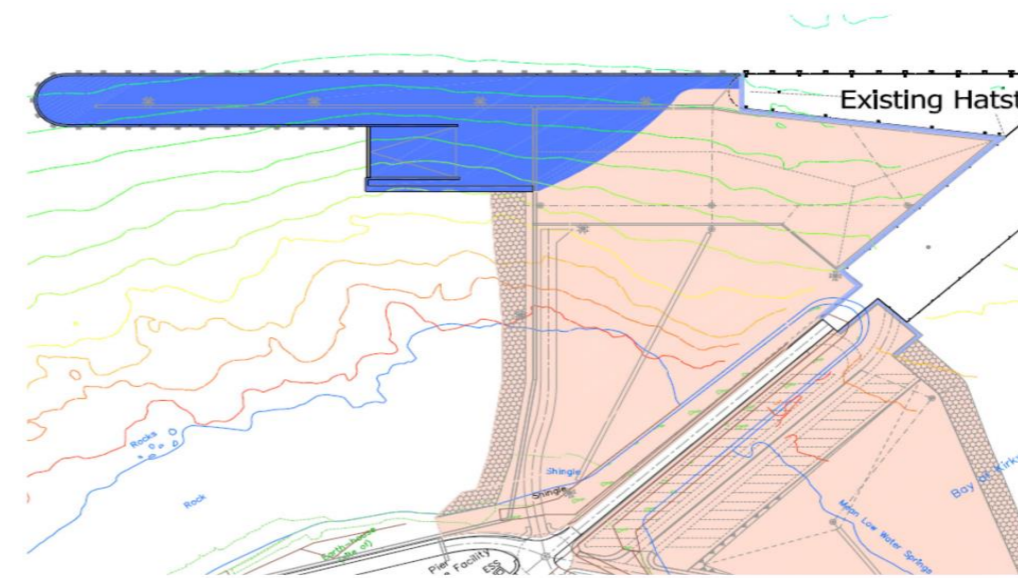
Phase 2 – Access approach channel to existing ferry causeway
